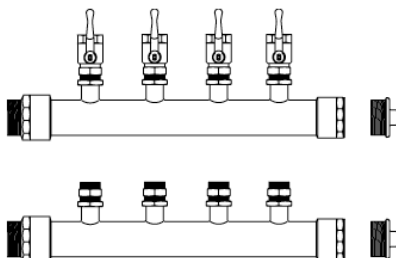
9 Dimplex SI 11TE Manifolds, p4
